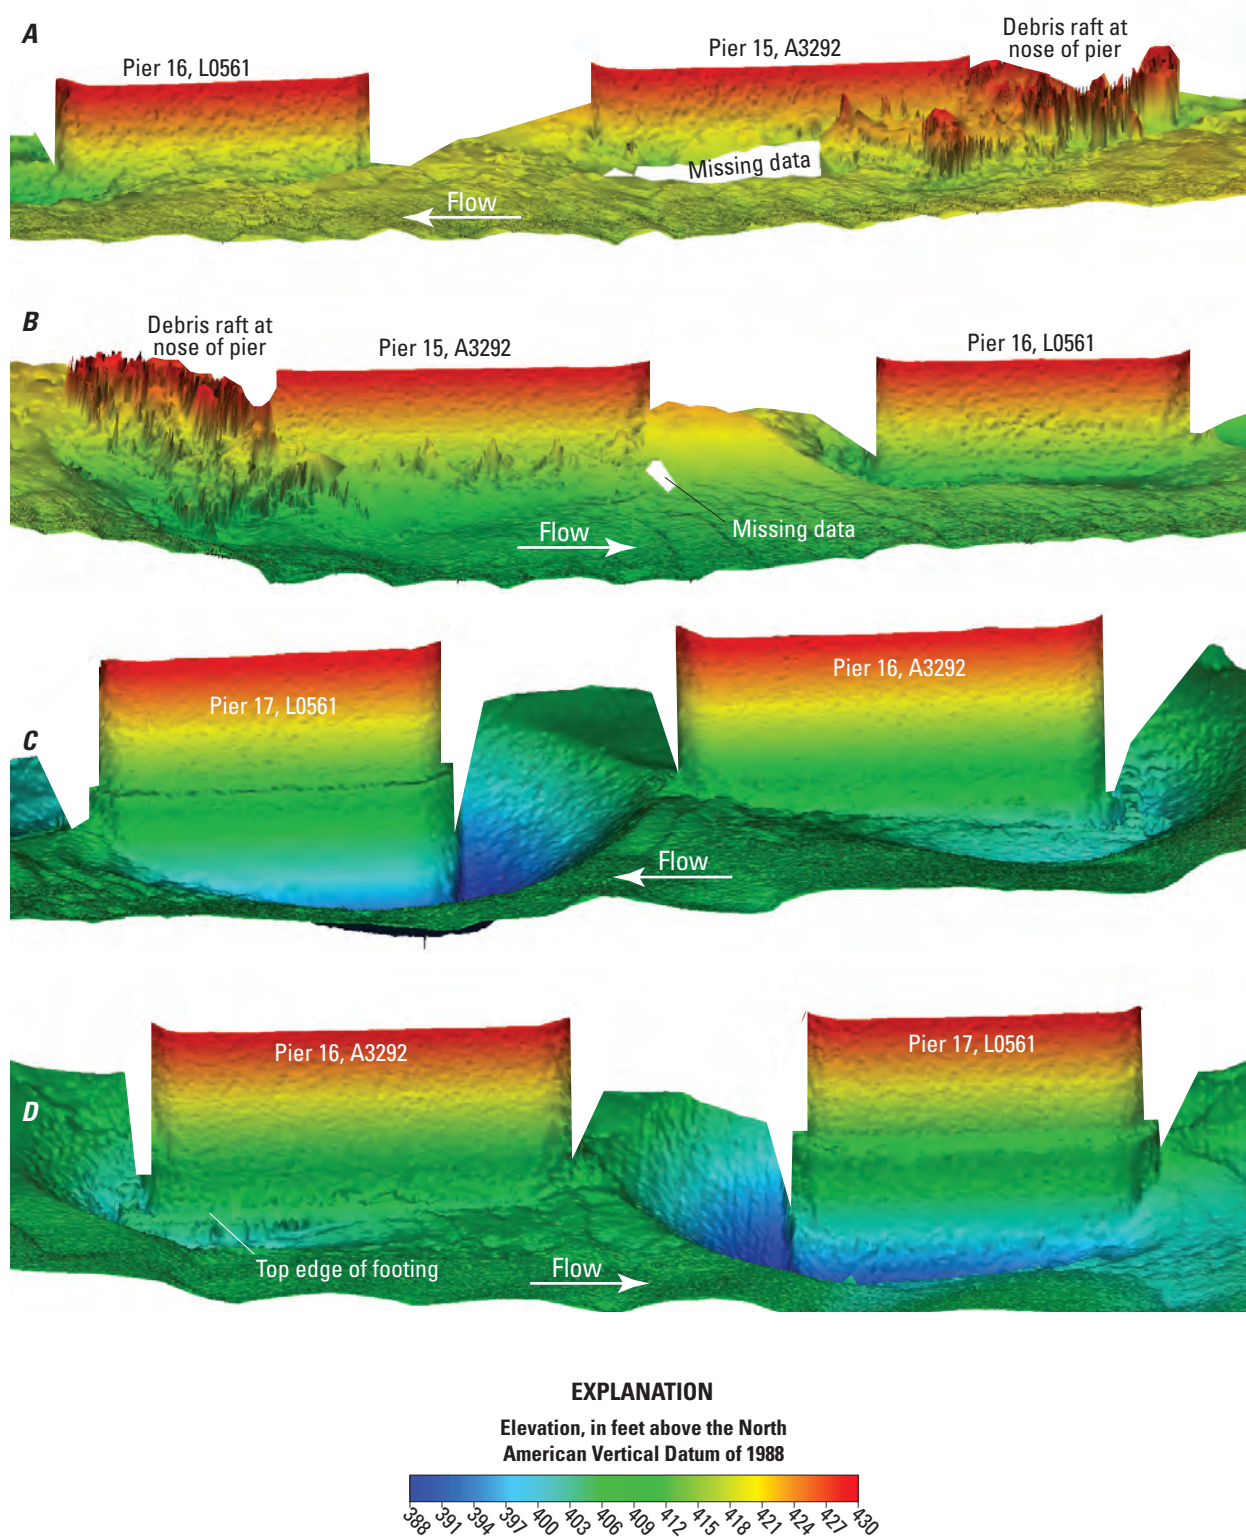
Shaded triangulated irregular network visualization of the channel bed and piers of structures A3292 and L0561 on Interstate 70 crossing the Missouri River near St. Louis, Missouri. *A*, left (northwest) side of piers 15 and 16. *B*, right (southeast) side of piers 15 and 16. *C*, left (northwest) side of piers 16 and 17. *D*, right (southeast) side of piers 16 and 17.
